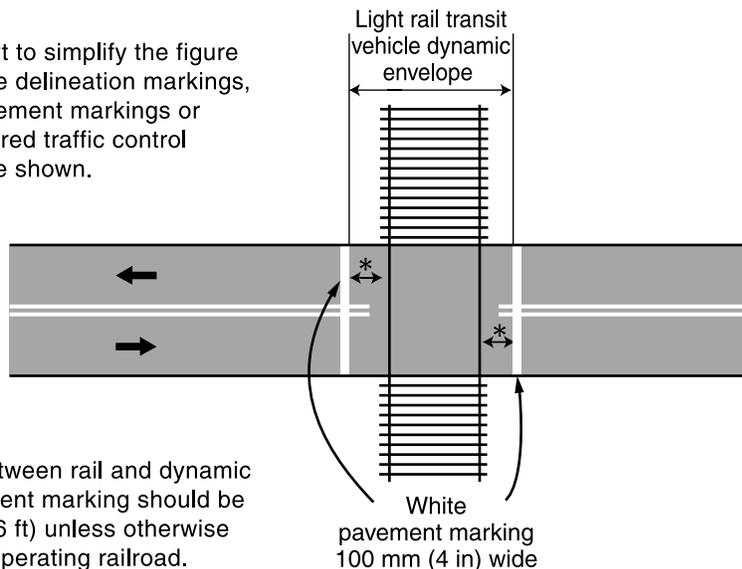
C-2. Typical Light Rail Transit Vehicle Dynamic Envelope Delineation Pavement Markings
